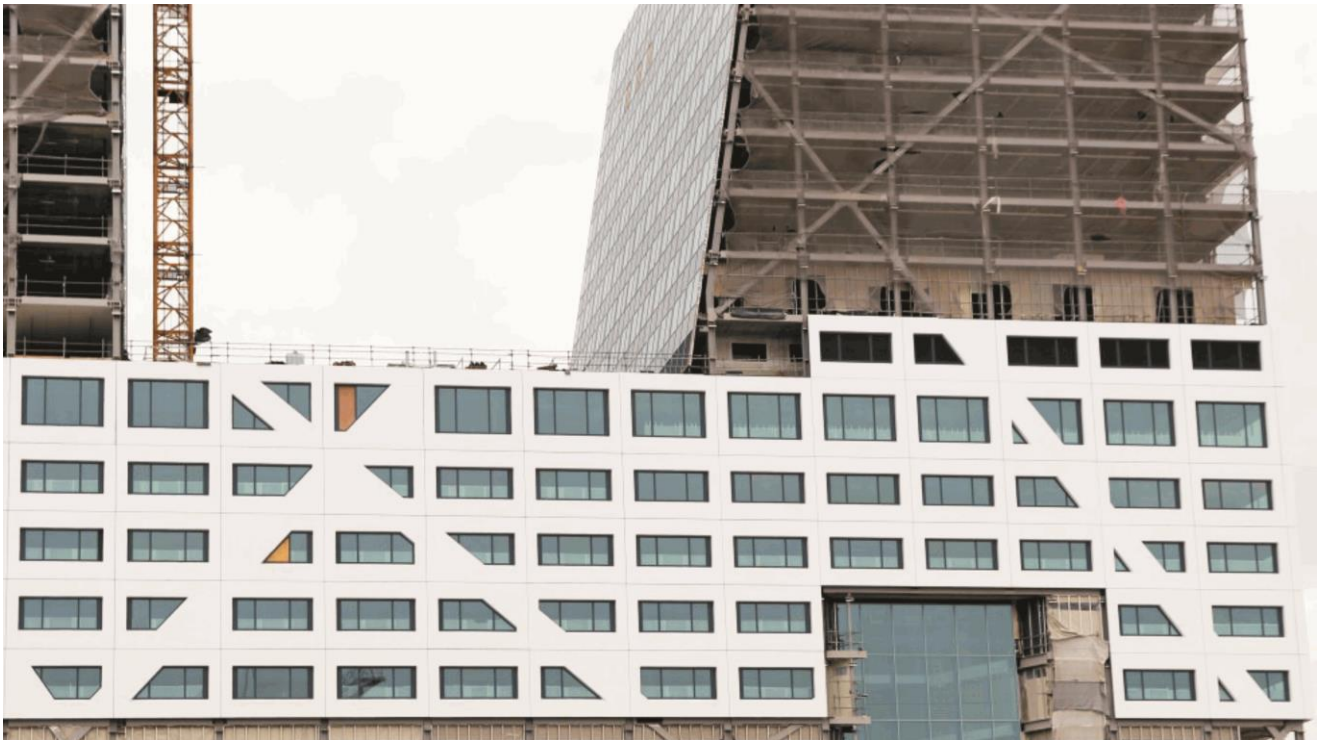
Installation of exterior wall panels in the construction of the Utrecht city council offices.
